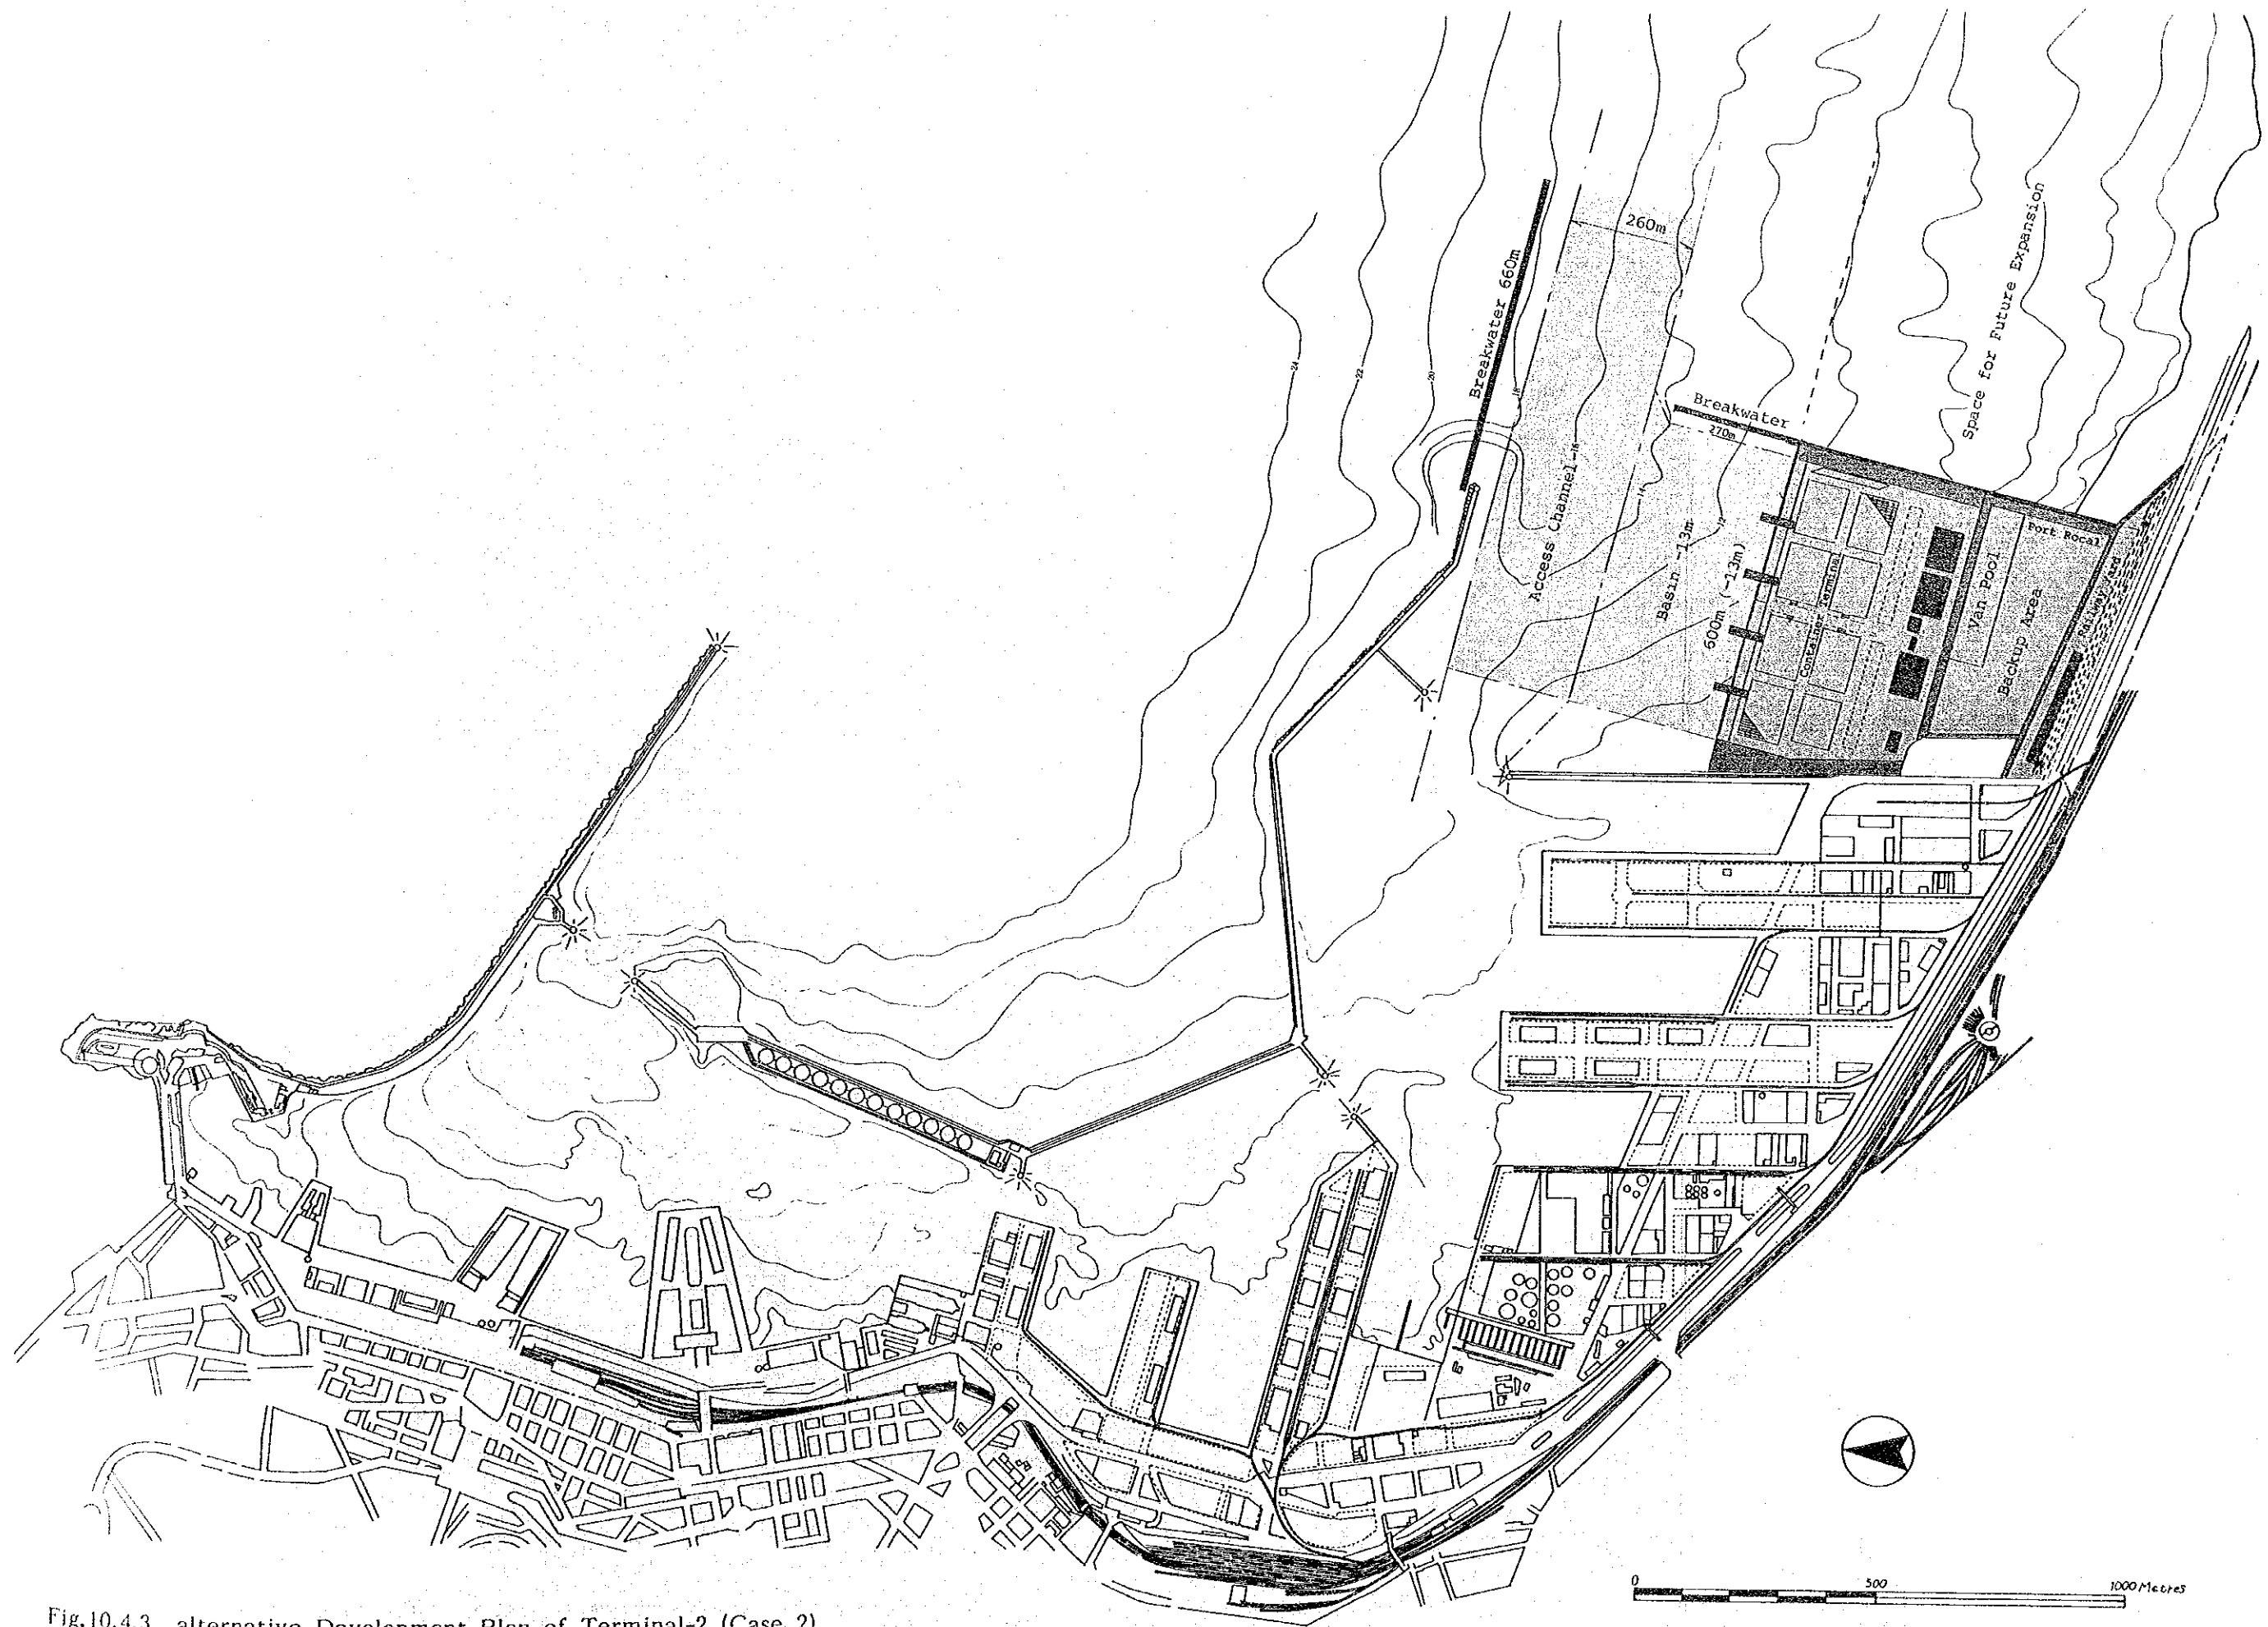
alternative Development Plan of Terminal-2 (Case 2)
